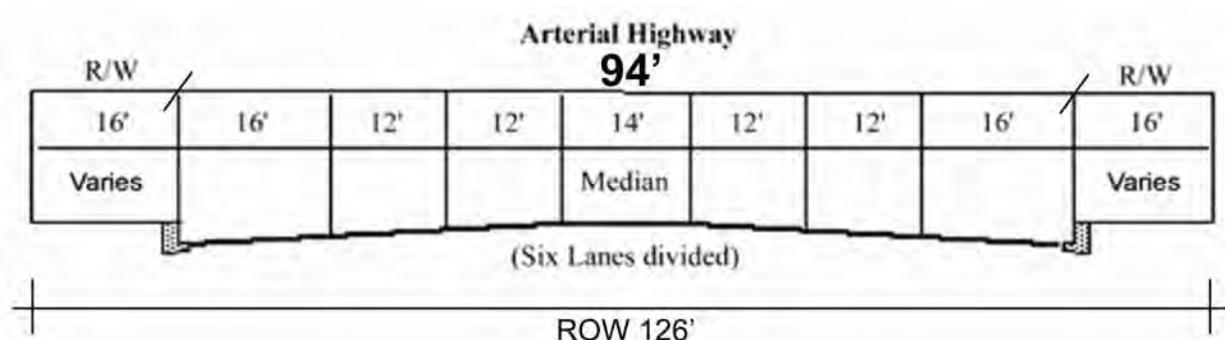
Date Palm Drive Proposed Cross Section per General Plan Circulation Element
